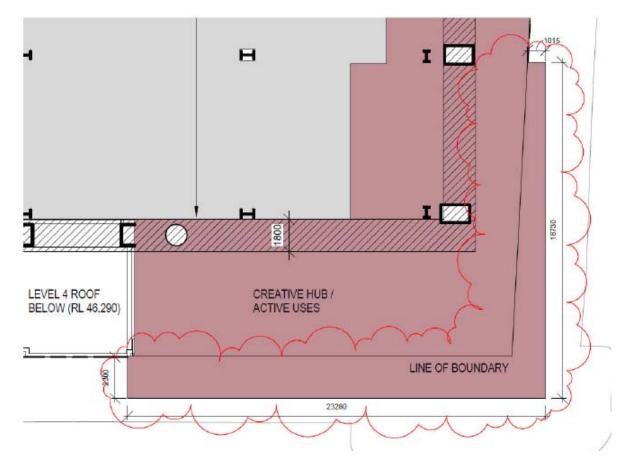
Plan showing extent of overhang to Pitt and Bathurst Streets (shown clouded) on levels 2-4
